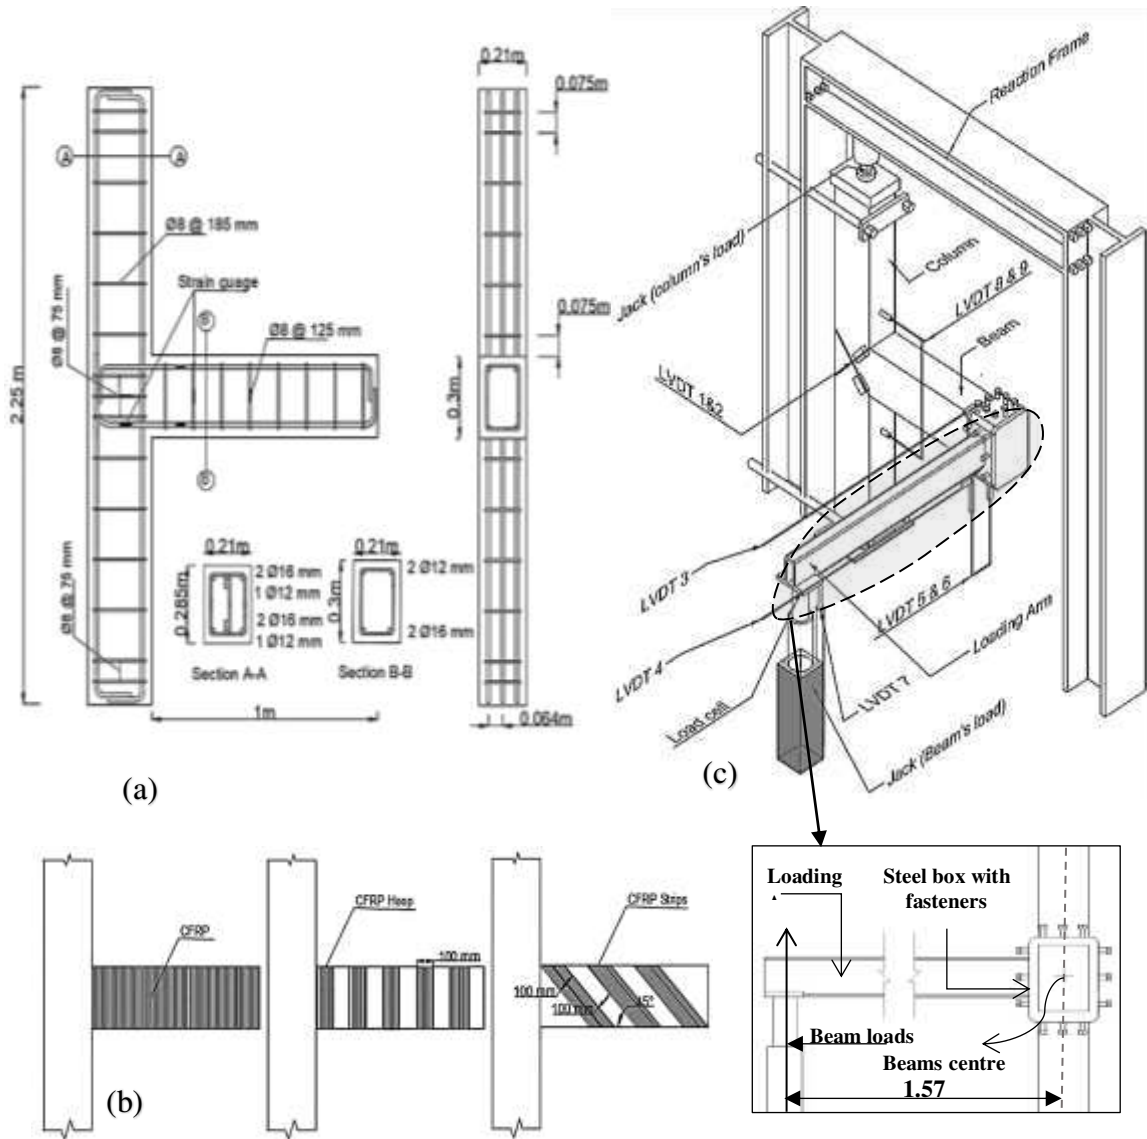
(a) Specimen details (b) Scheme details (c) Test Set-up
